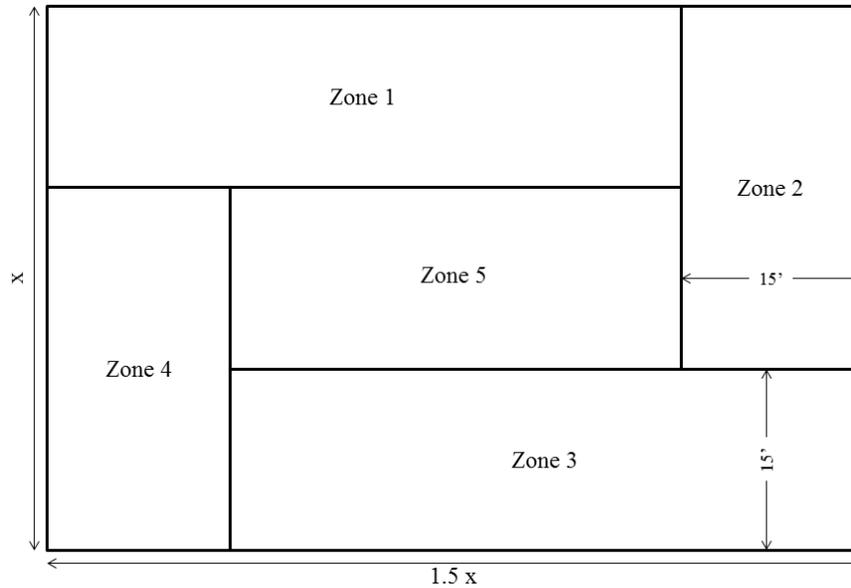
Office zonal floor plan representing 1 of 3 identical floors
